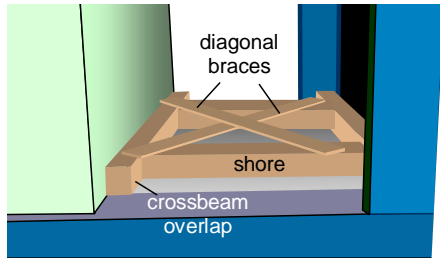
Shoring arrangement showing cross beam overlap and diagonal braces
